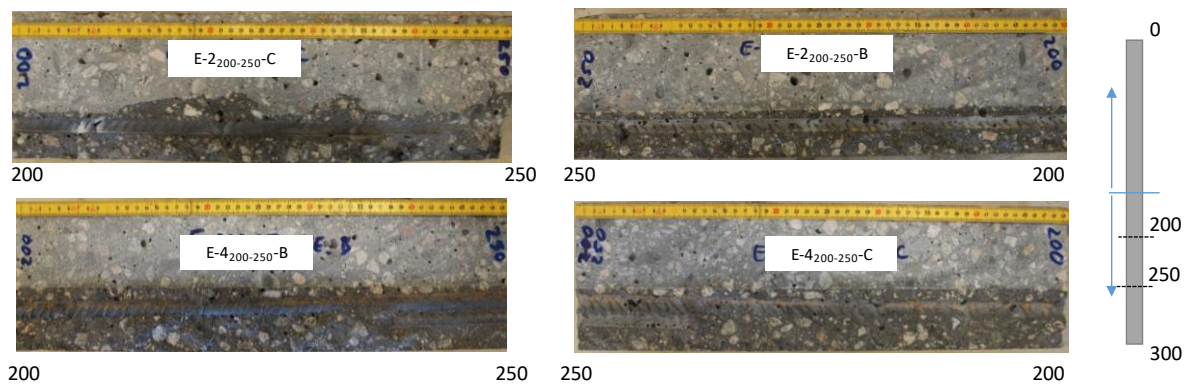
Steel-concrete interface of beam E section 200 to 250 cm. White precipitate at the cracks and spread over the steel-concrete interface. Superficial rust
